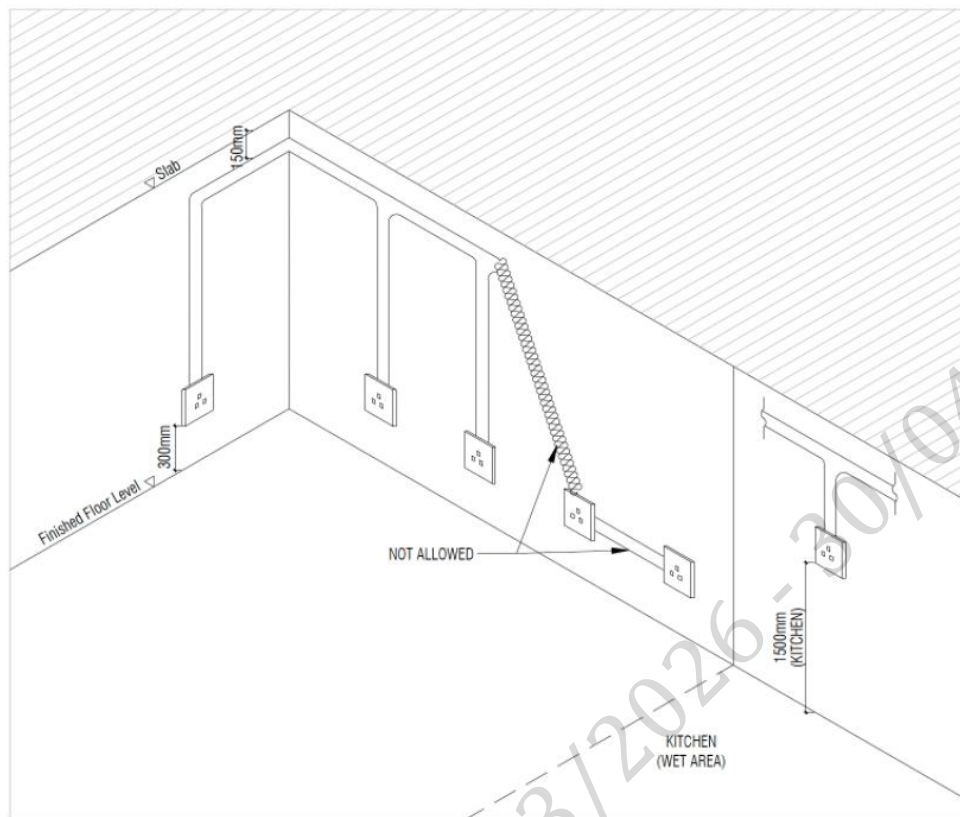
Position of cable installed or concealed inside walls, within partitions or similar
